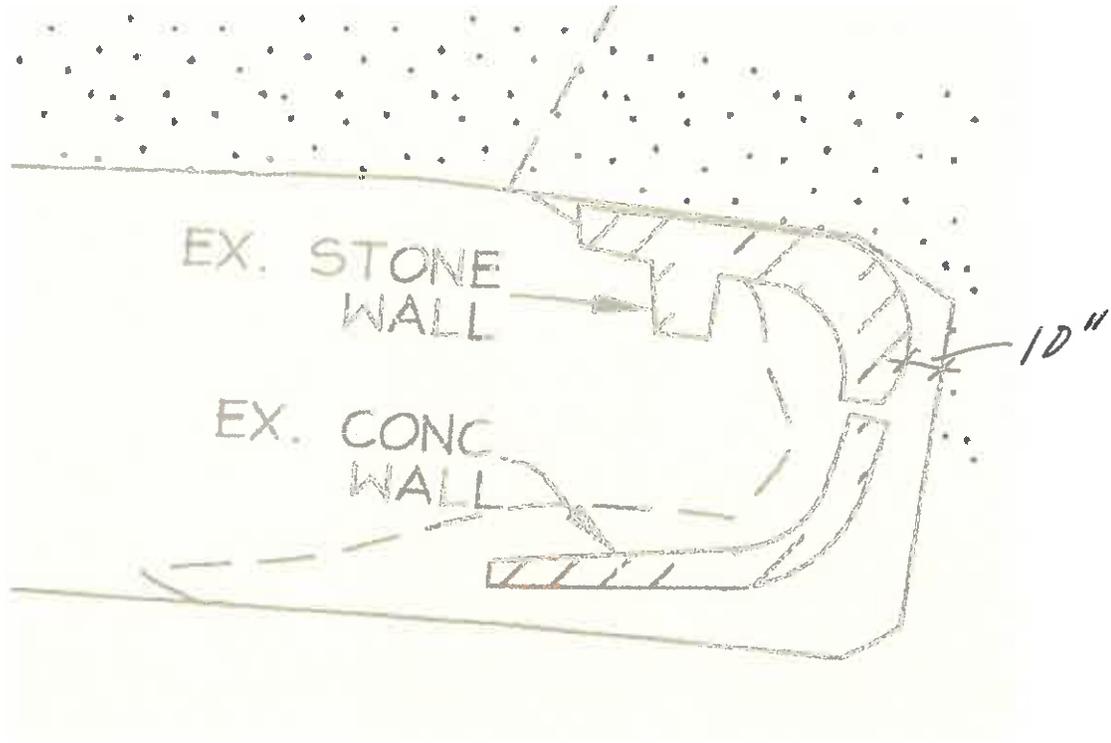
Detail from an early plat of the property, depicting the wall, supplied by the Applicants.
